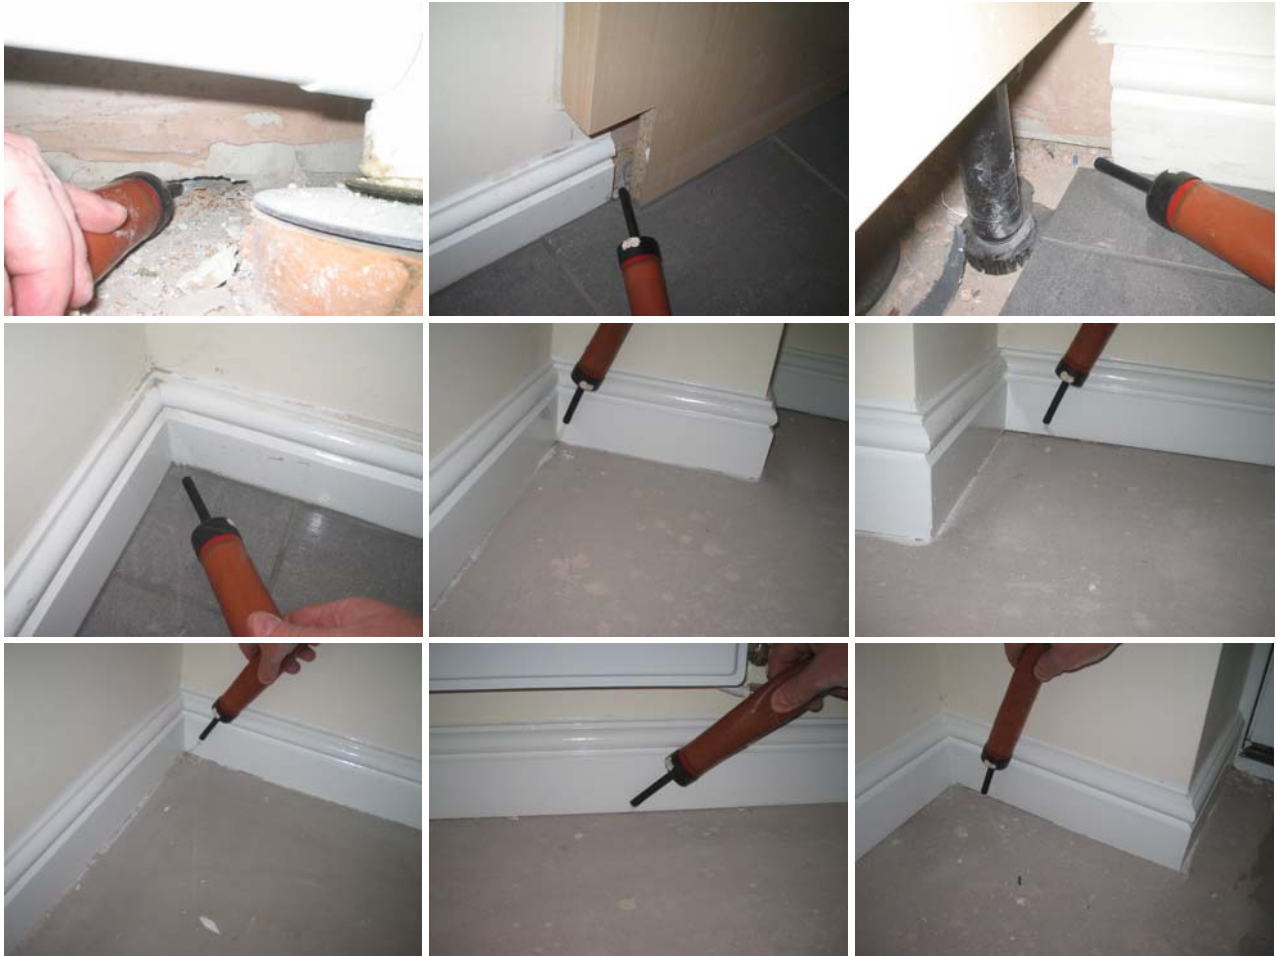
Air leakage at wall/floor junctions on the ground floor, in hidden areas behind units in the utility room and kitchen, under the skirting in the kitchen, dining room and hall on internal and external walls.
